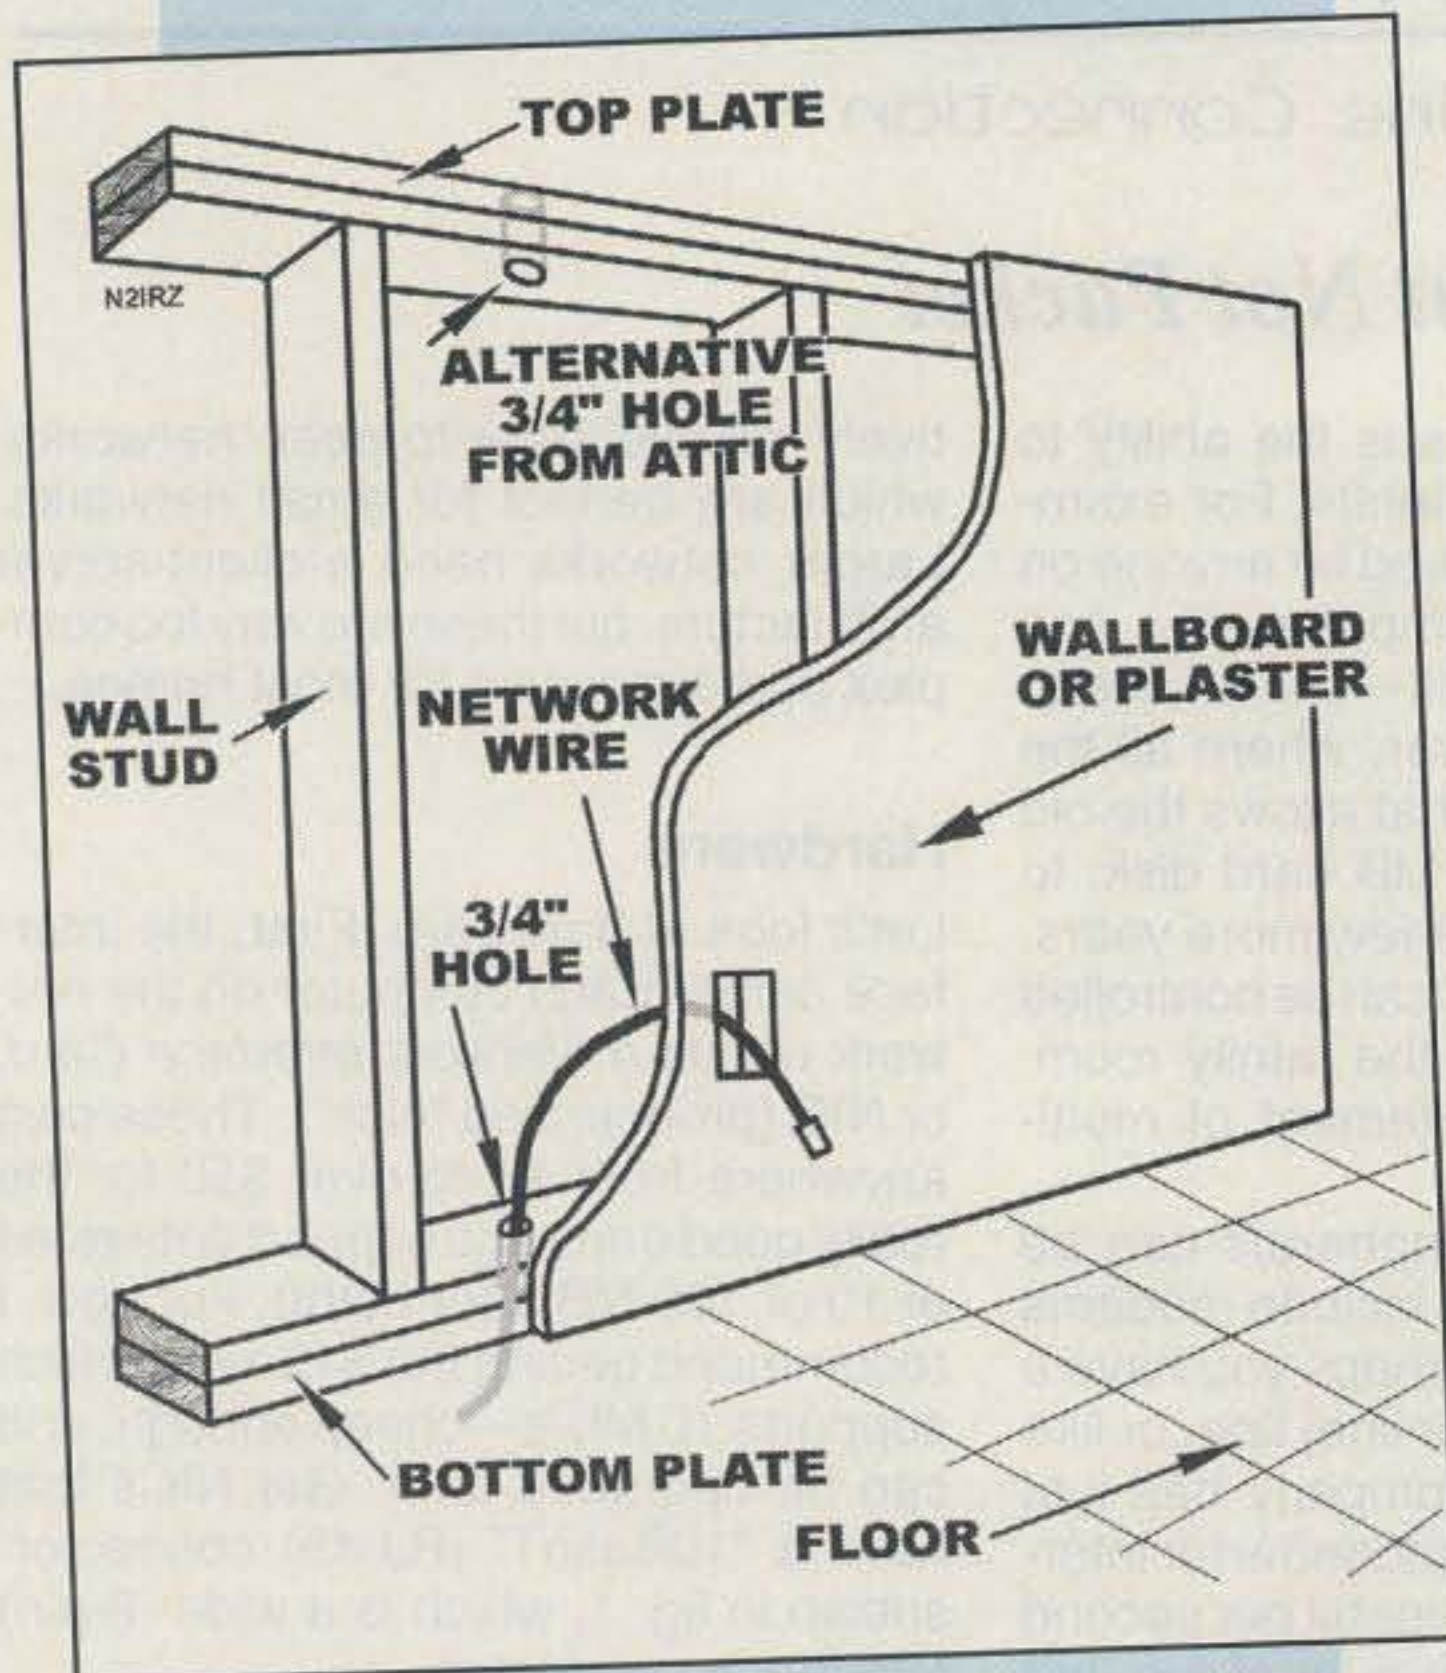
Typical stud-frame construction. Running a new wire inside a wall isn't as hard as it looks. Cut a small hole into the wallboard (later covered by a wall plate), and drill a hole into the bottom or top plate from the basement or attic. Use a coat hanger to fish the new wire through both holes. See the text for important safety notes.
